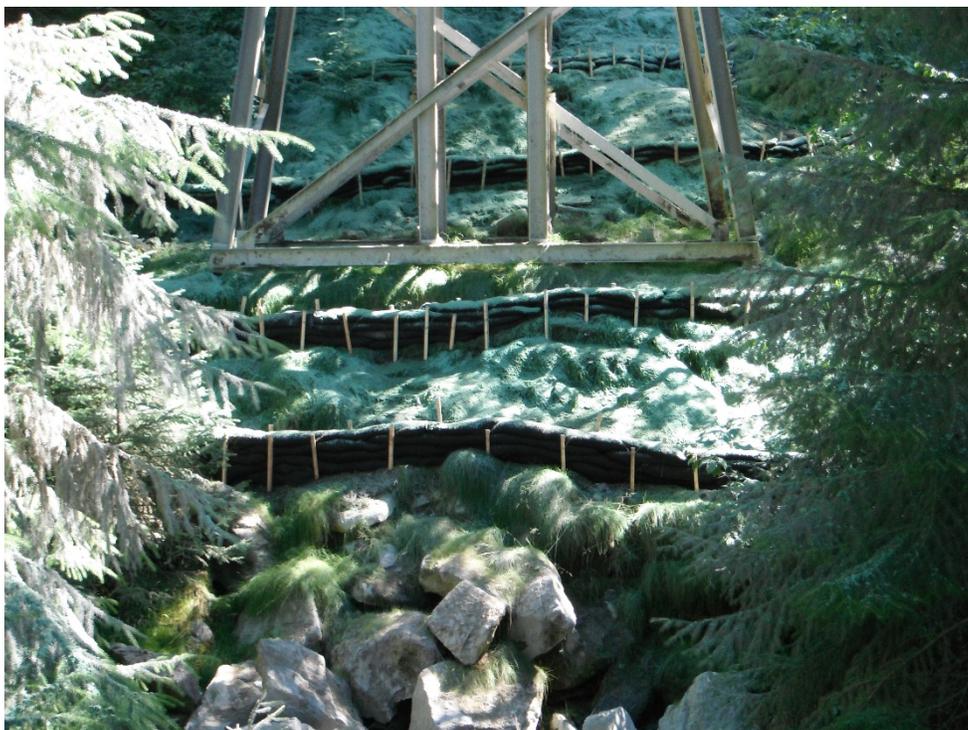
New BMPs under 3.0-mile bridge, after hydroseeding.
